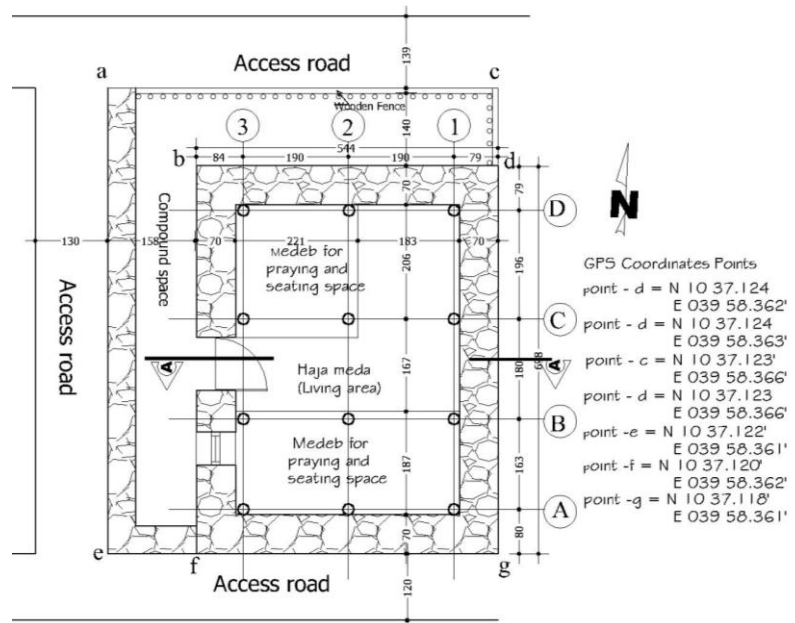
213 Compound and floor plan of Ato Harun Mohamednur Esmail's house.
